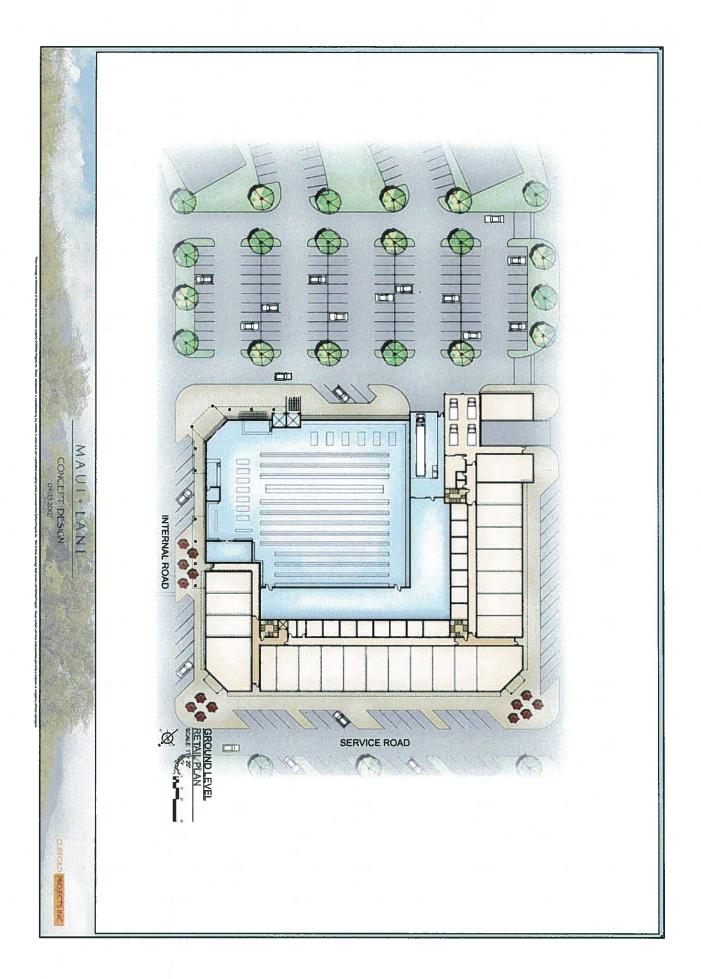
Maui Lani Mixed Use Ground Floor Plan (Major Tenant B)
